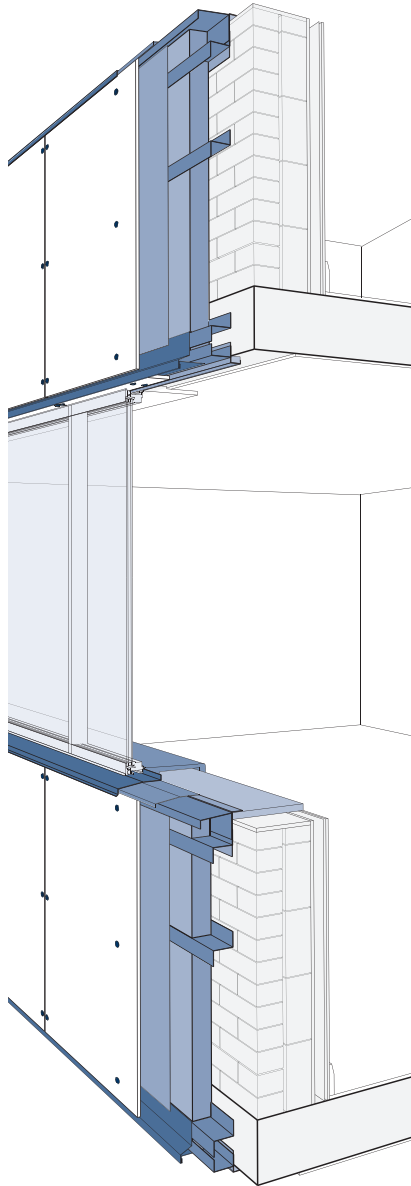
Gaskets are applied over the vertical hat channels prior to the installation of the cladding panels. The panels are subsequently fastened according to the manufacturer's installation instructions and as approved by the cladding engineer for resistance to wind loads.
